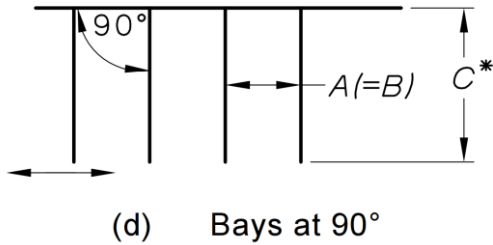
Excerpt of 90-Degree Parking Spaces Layout from AS 2890.1 Figure 2.2
